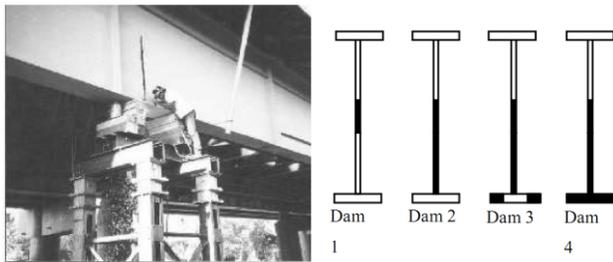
Damage Detection Study of the I-40 Bridge over the Rio Grande in New Mexico, USA. Left figure: electric saw cutting cause damage in the bridge girder right figure: The levels of introduced damage in the girder (the shaded area is the reduced cross-section)[7].
